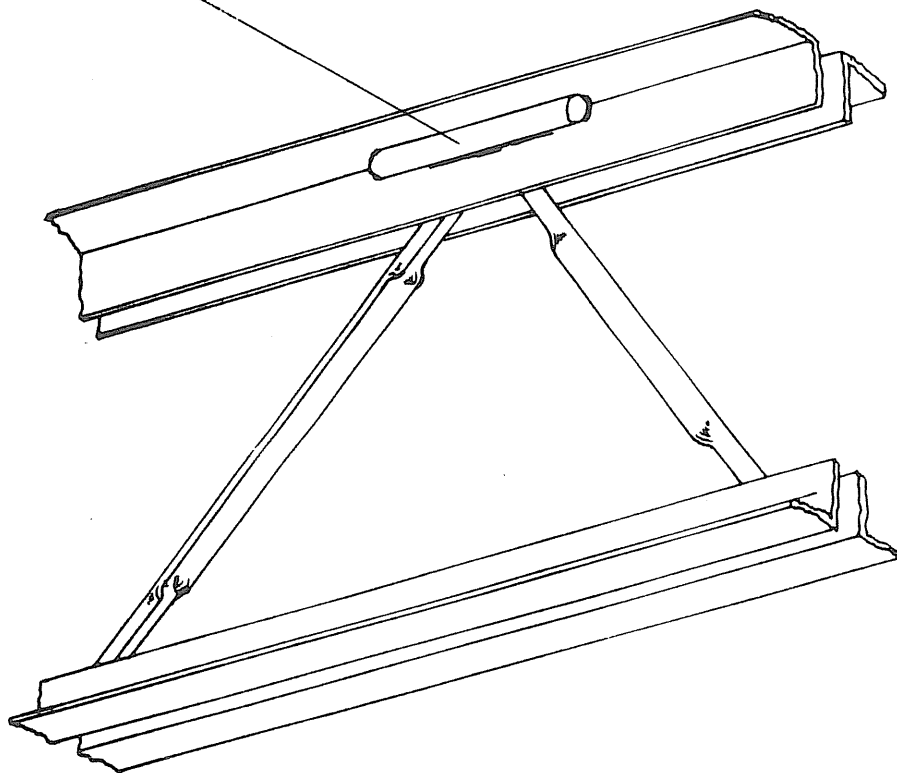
Angle Web Joist Reinforcement at Top Chord Panel Point
